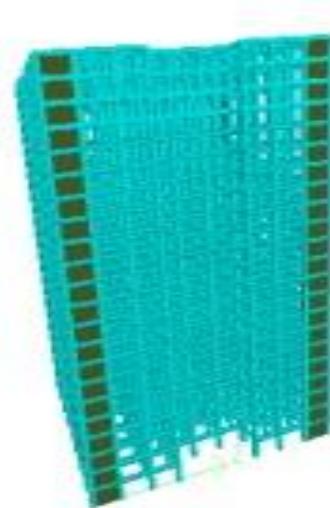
Rendered view of STAAD.Pro model with shear wall
